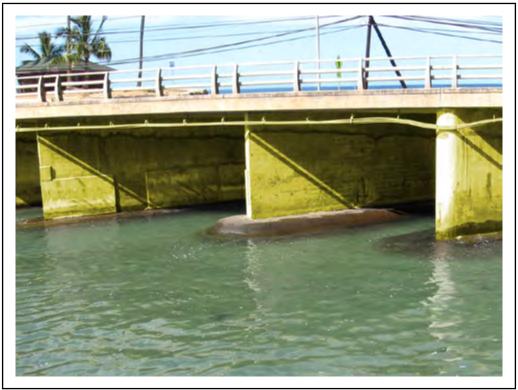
Reinforced Concrete Pier Wall (Highlighted)
